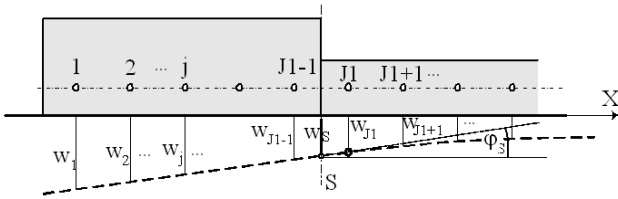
Boundary conditions on the connection of the rigid footing with the foundation beam
